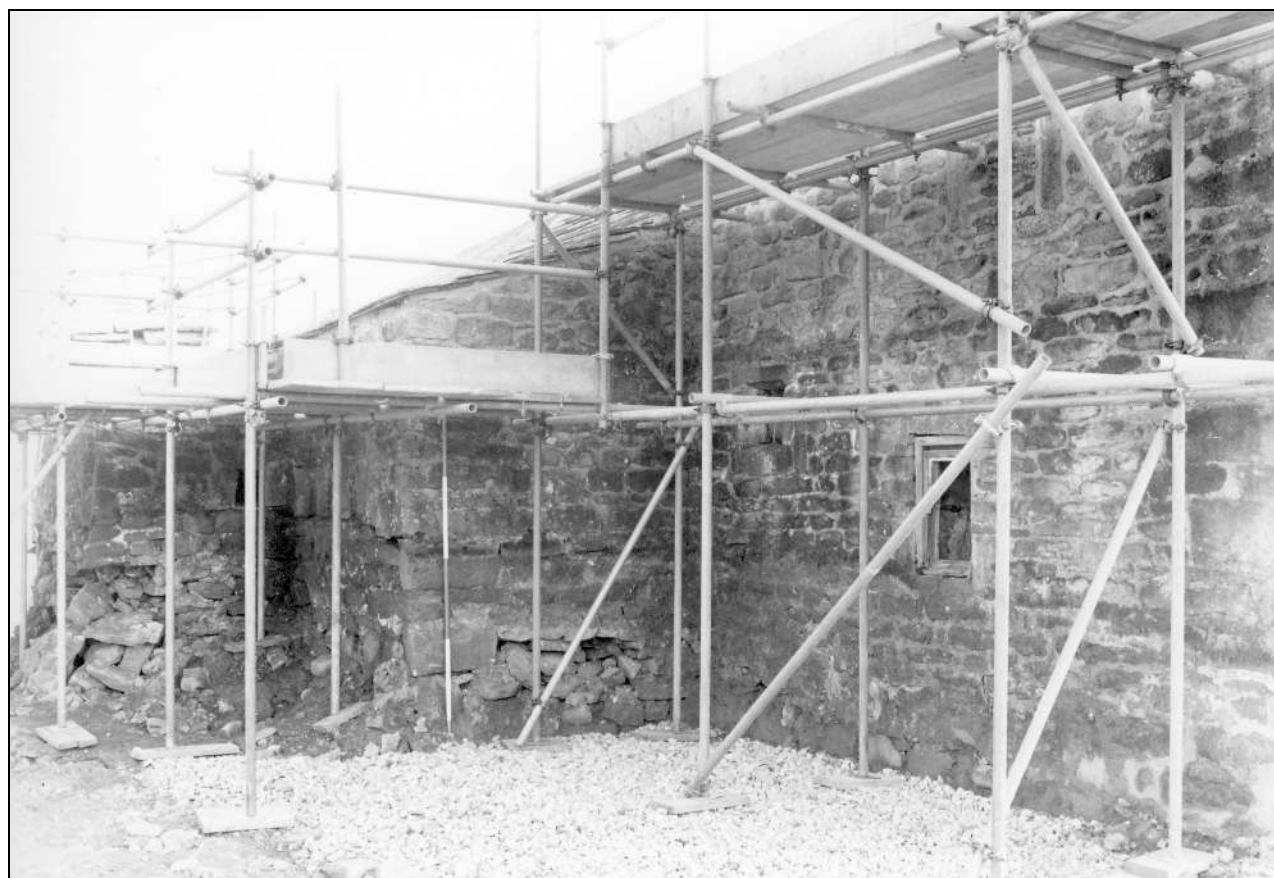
Rear of house from the north-west, while scaffolded (film 3, frame 13)
